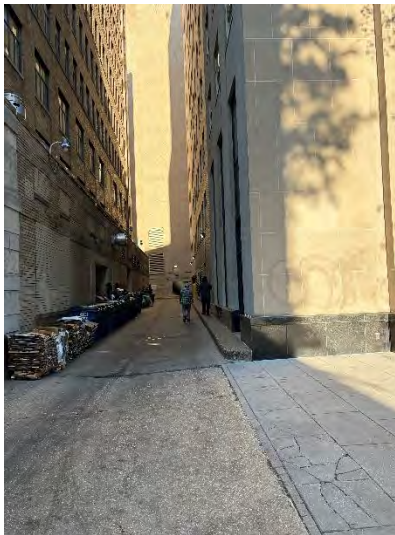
Alley way in Between Lafayette Building (left) and Adjacent Building (right) Taken from Sidewalk on 15th Street
